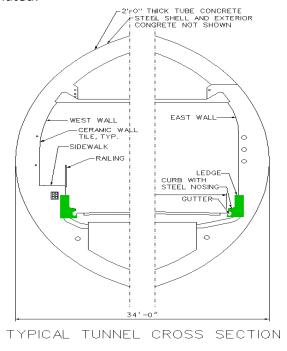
Typical Tunnel Concrete Barrier in Cross Section
